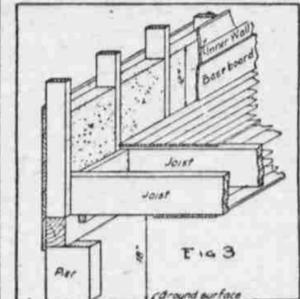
Buildings Supported on Piers Are Ratproofed by Raising Above Ground Level and Placing Concrete Between Walls Above Sills.
